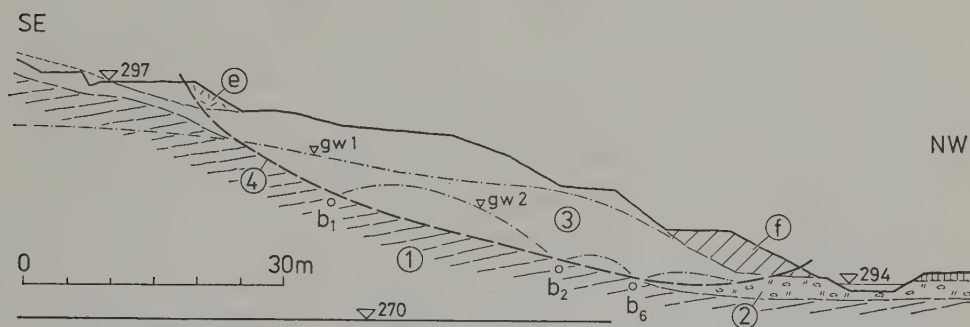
Spreading failure of the subsoil of an embankment caused by the pressure of groundwater in a layer of Neogene sand (2); 1 — Neogene clay, 3 — loess loam, 4 — original embankment, 5 — collapsed portion of the embankment.
